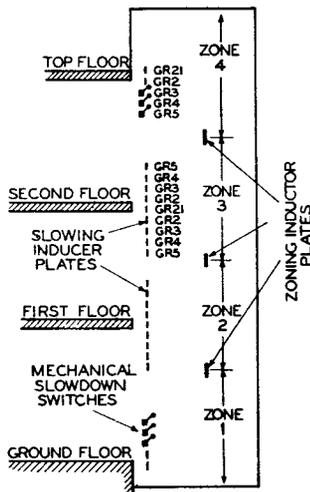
TYPICAL LAYOUT OF ZONE AND INDUCER PLATES.
